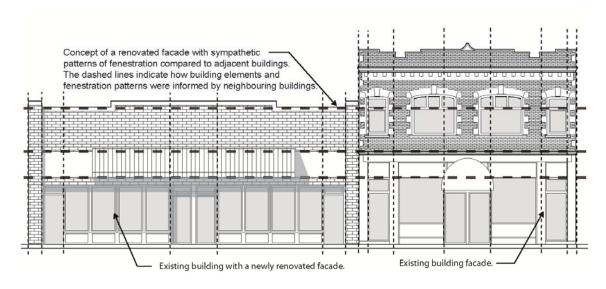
Diagram Showing Sympathetic Patterns of Fenestration between Adjacent Buildings
